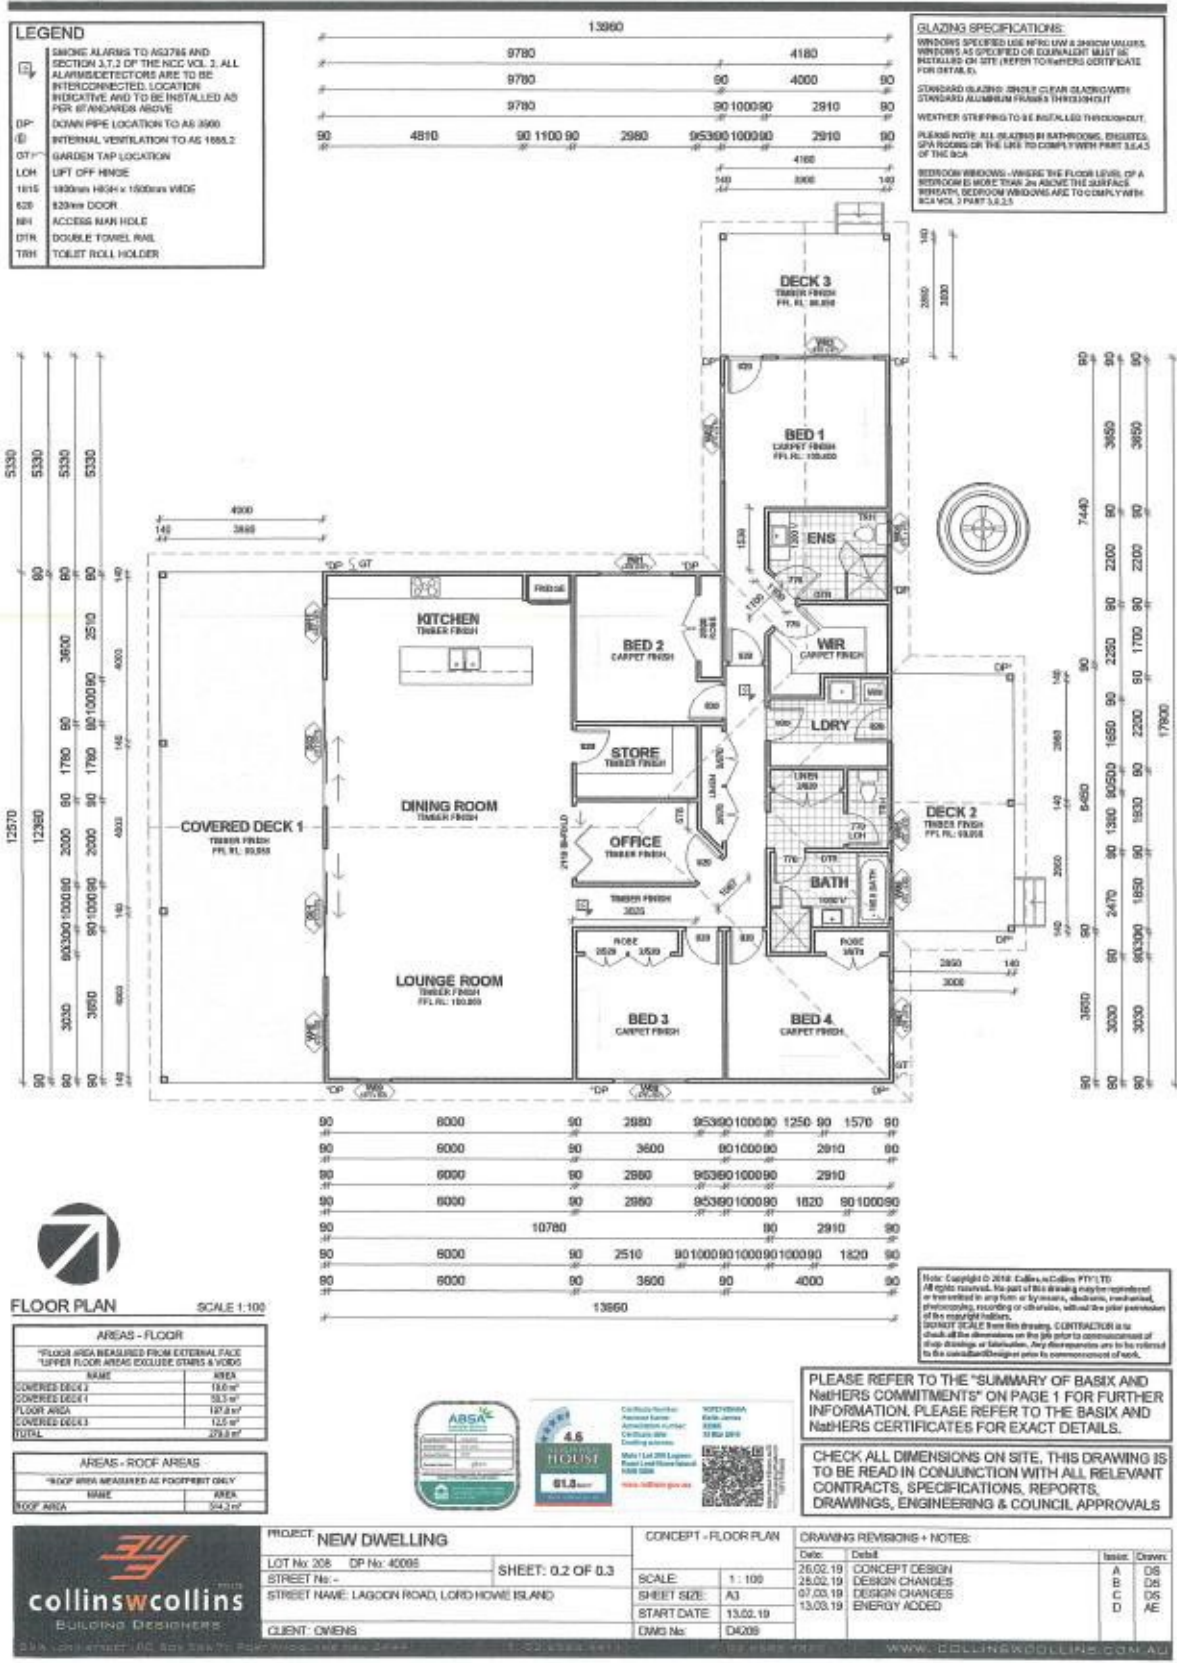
Applicant's proposed Lot A Dwelling Floor Plan
